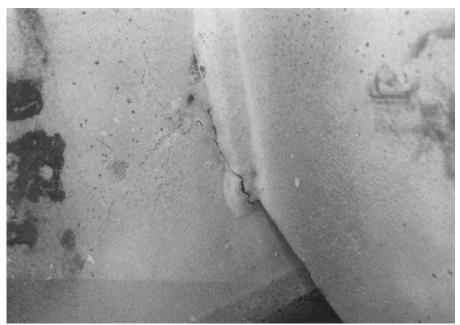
Web Gap Cracking at End of Transverse Connection Plate
